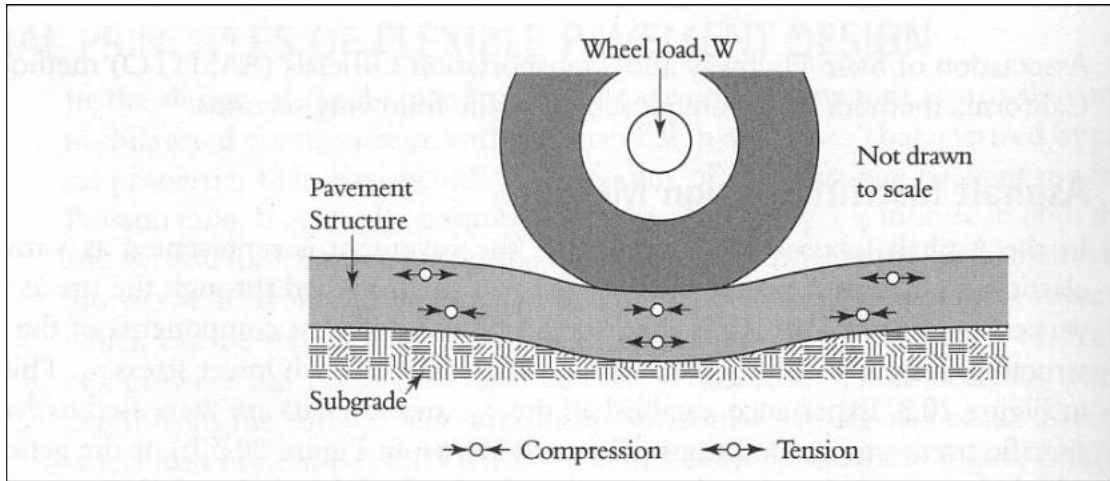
Schematic of Tensile and Compressive Stresses in Pavement Structure
